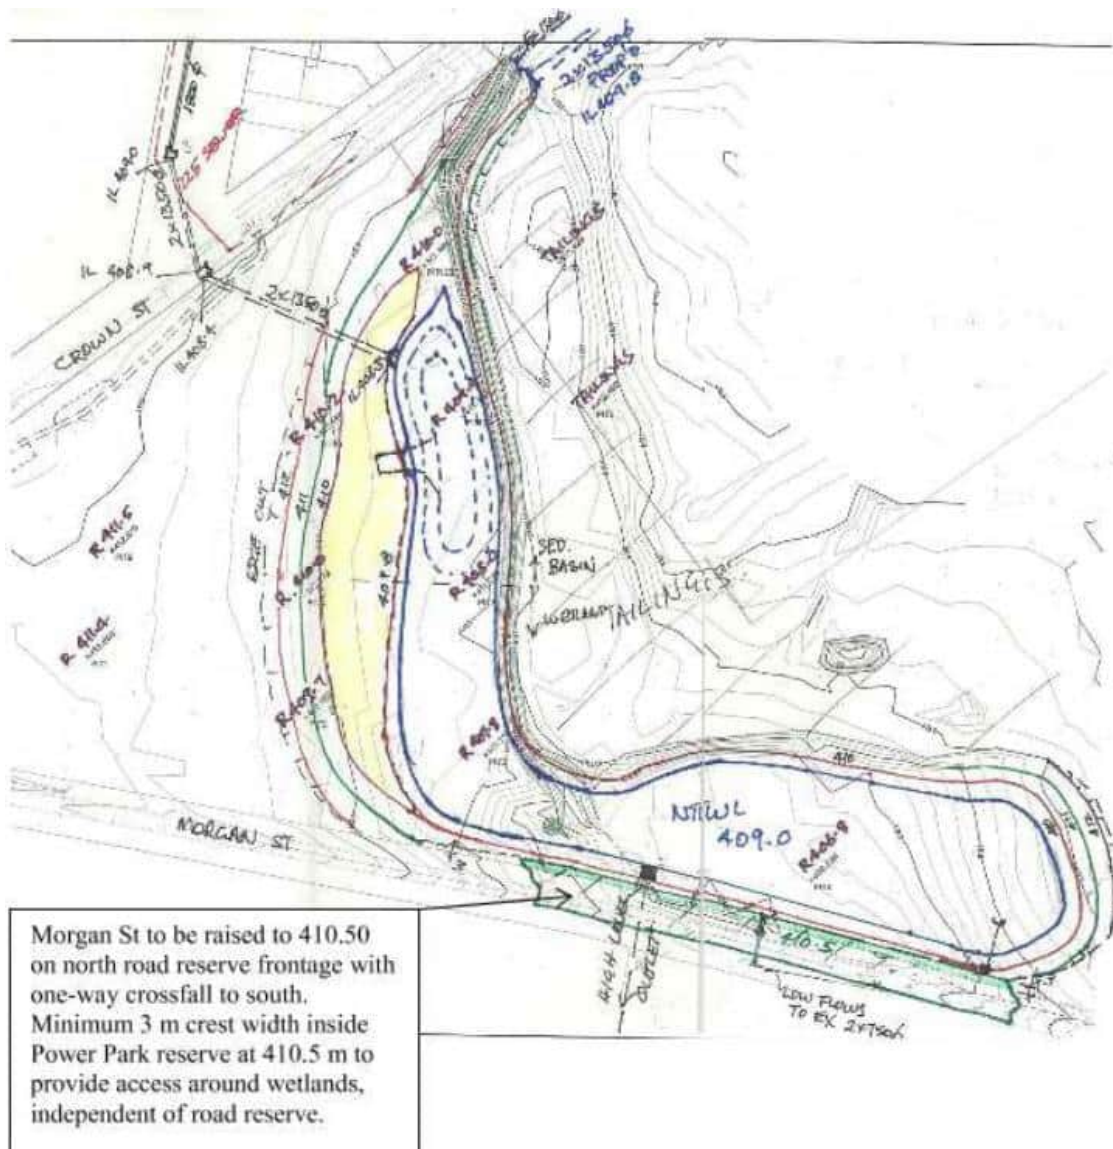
RETARDING BASIN 28 CONCEPT LAYOUT
